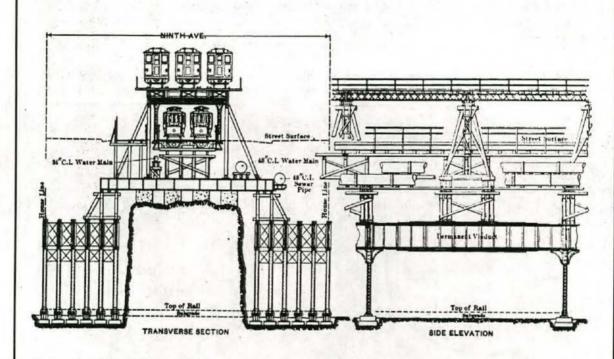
North River Division - Arrangement of Structures Supporting Ninth Avenue During Progress of Excavation (New York Tunnel Extension - The Pennsylvania Railroad Description of the Work and Facilities p. 53.)
